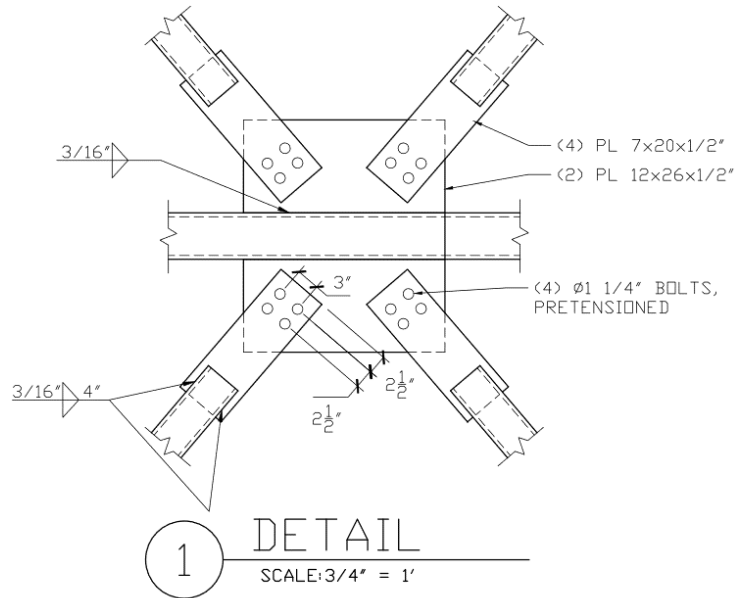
Shop drawing showing slot and knife plate assembly for HSS 3x3x1/4
